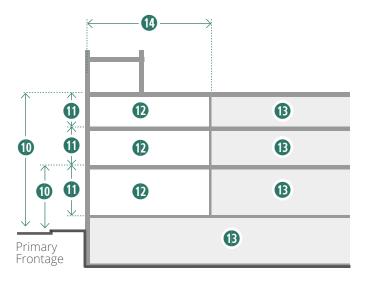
H-2. Civic Building: Height & Use Requirements
